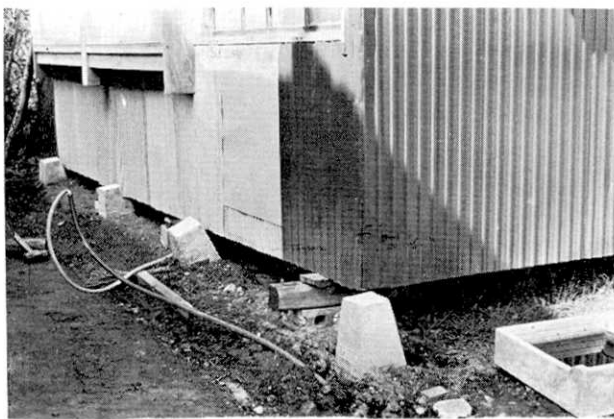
Sliding of a house from the foundation blocks at Etyubata, Yuta-machi.
